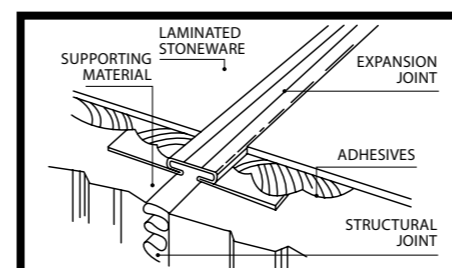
In correspondence with a structural joint in the screed, it is mandatory to provide an expansion joint with a width that is at least the size of the existing one.
